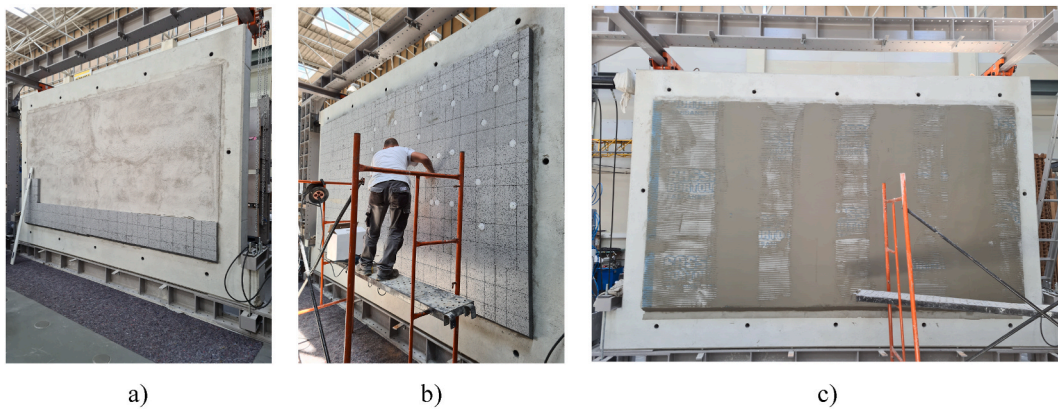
Retrofitting process of specimen E: a) positioning of the EPS plates; b) application of the plastic connectors; and c) application of the nonstructural mesh.
